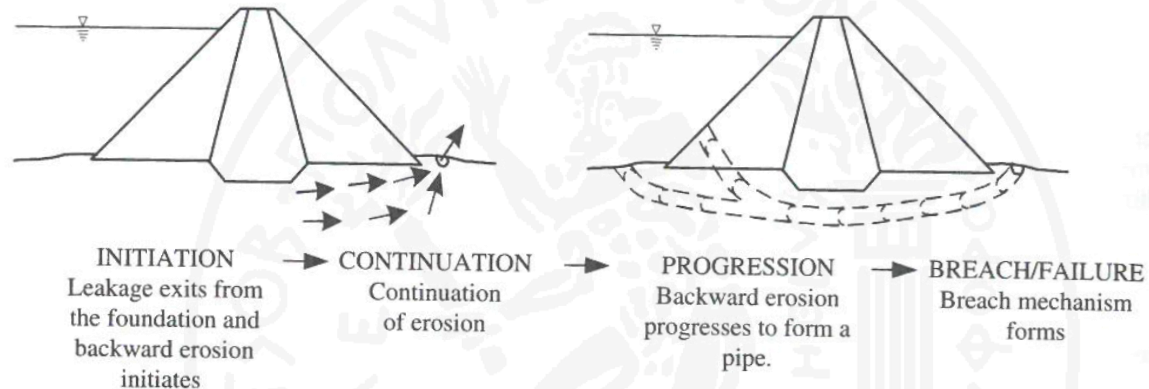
Model for development of failure by piping in the foundation (Foster, 1999).
